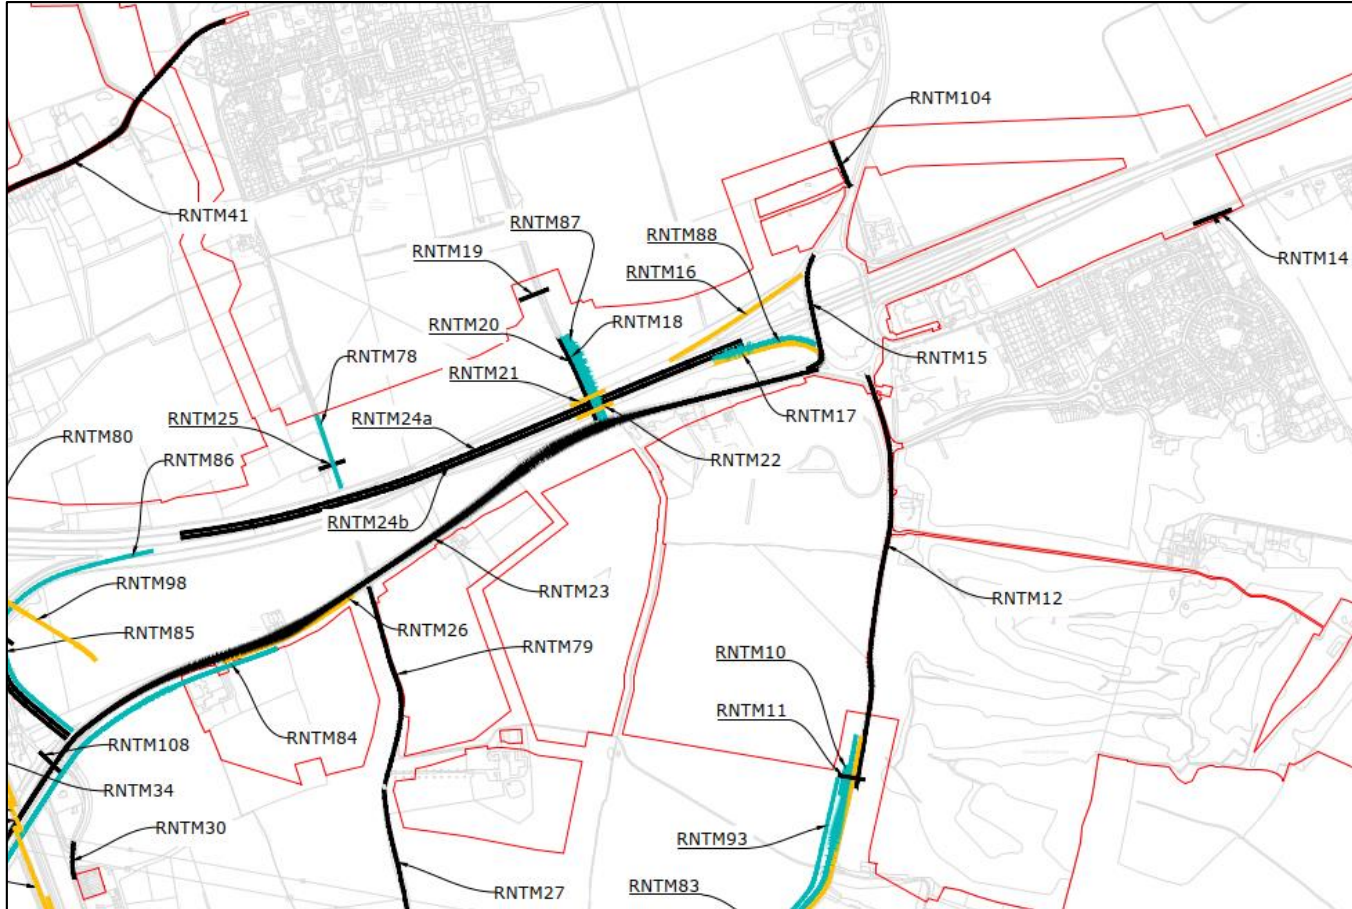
Roads North traffic management measures location plan (5 of 8)
